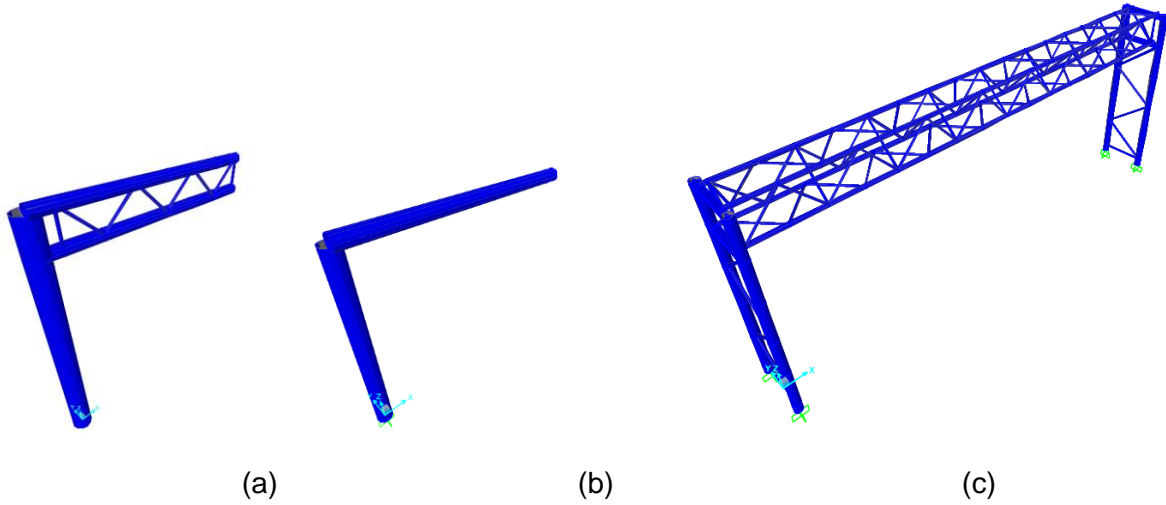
New York State sign structure models: (a) cantilevered truss; (b) cantilevered monotube; (c) bridge truss-type.
